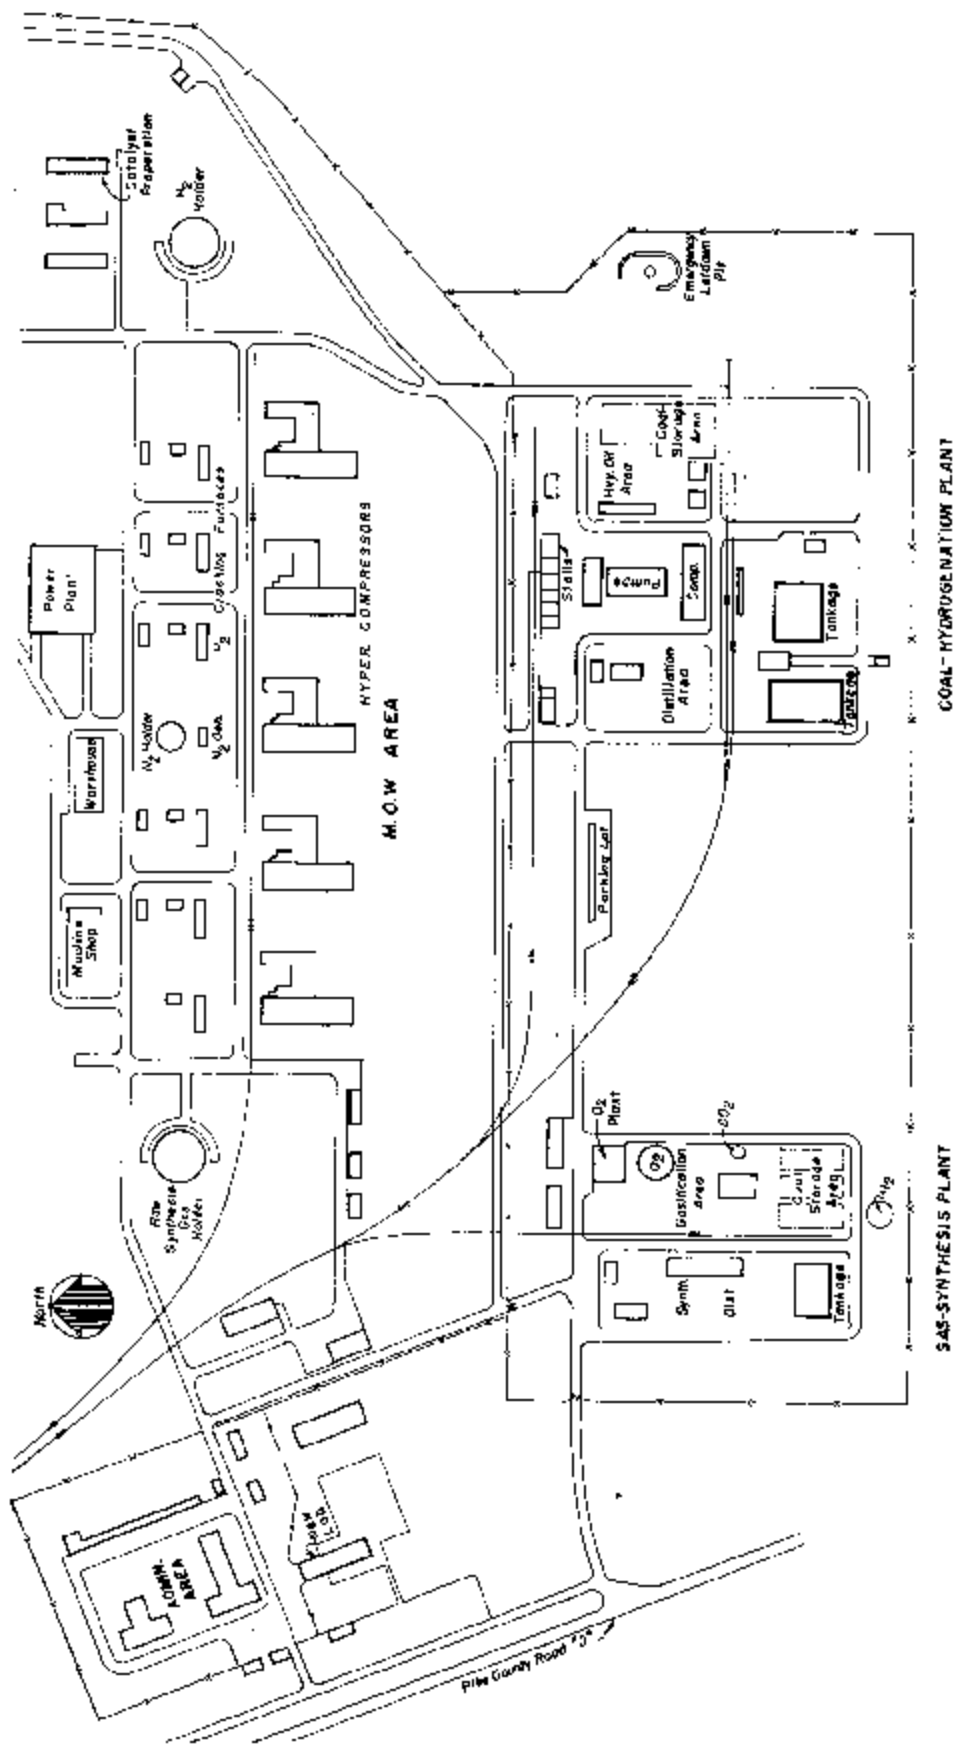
Plot plans, Coal-to-Oil Demonstration Plants.
